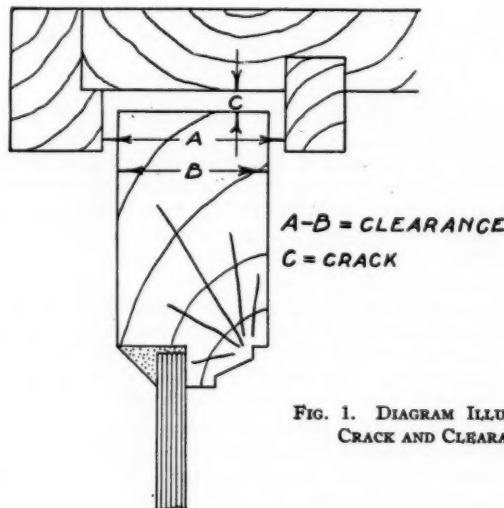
DIAGRAM ILLUSTRATING CRACK AND CLEARANCE
